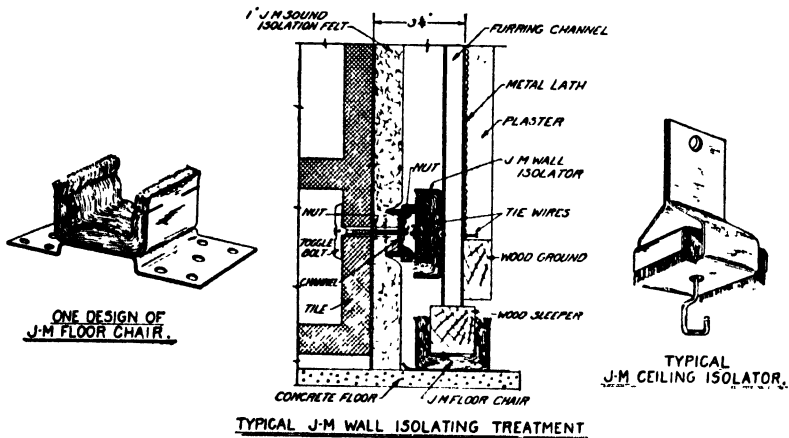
The Johns-Manville system of sound-insulation for ceiling, walls, and floors, showing a felt-lined floor chair, wall separator, and ceiling isolator.
